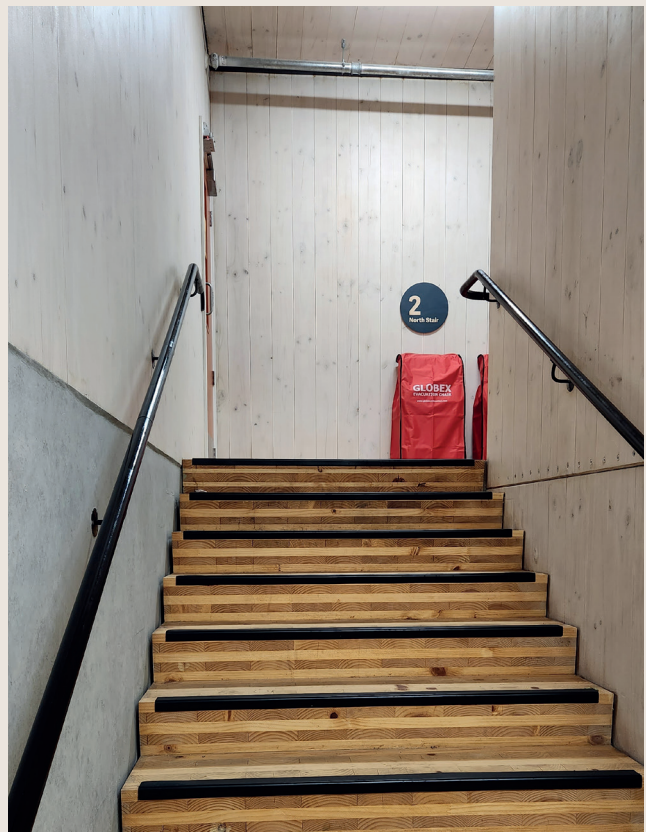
Timber wall and ceiling linings within safe path stairwells may require a fire-retardant treatment (Credit: E. Claridge)
